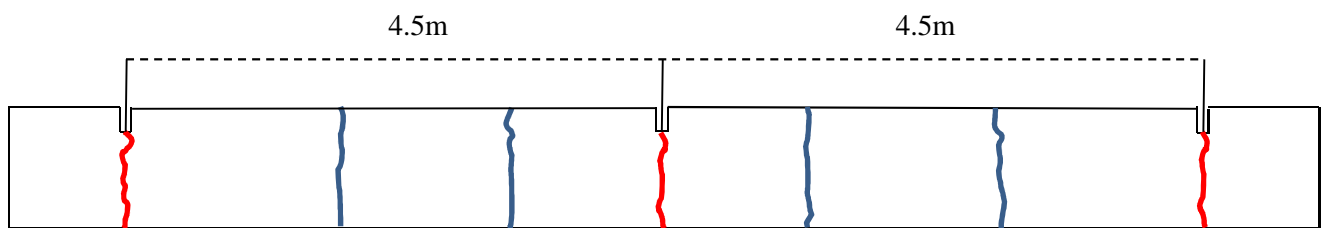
The crack pattern of a 4.5 m joint spacing slab containing 5 kg/m³ fibres
